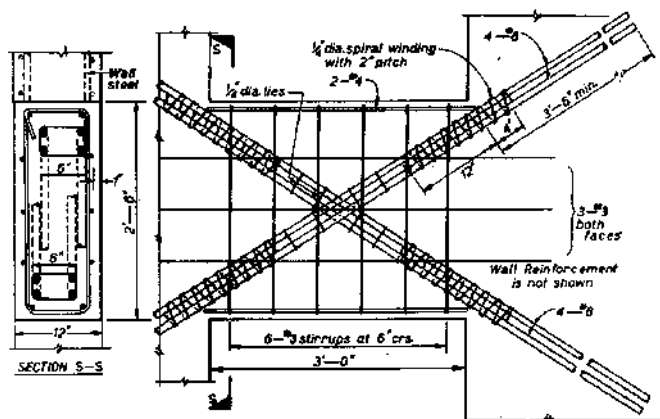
Suggested Steel Arrangement in Diagonally Reinforced Coupling Beams
